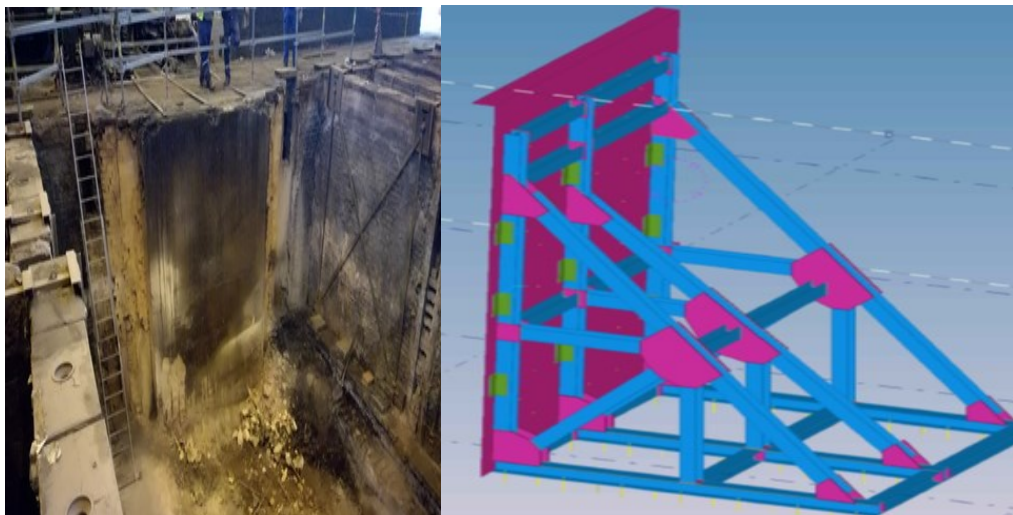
The east terminal crossover concrete wall (left) and stability structure used (right)
